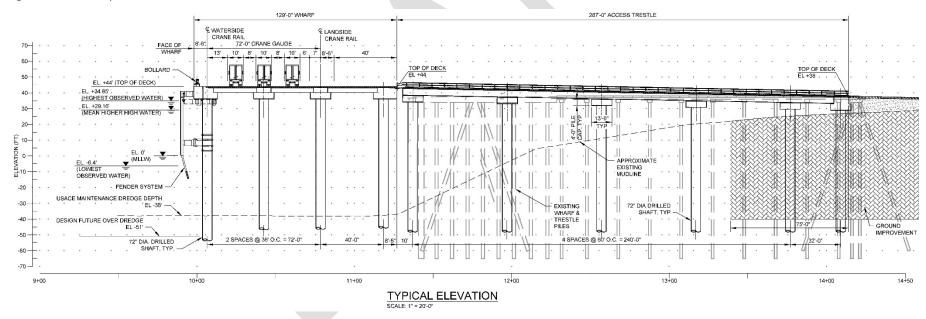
Longitudinal Elevation for T1 Access Trestles: Alternative 2B with 72-inch-diameter Drilled Shafts
